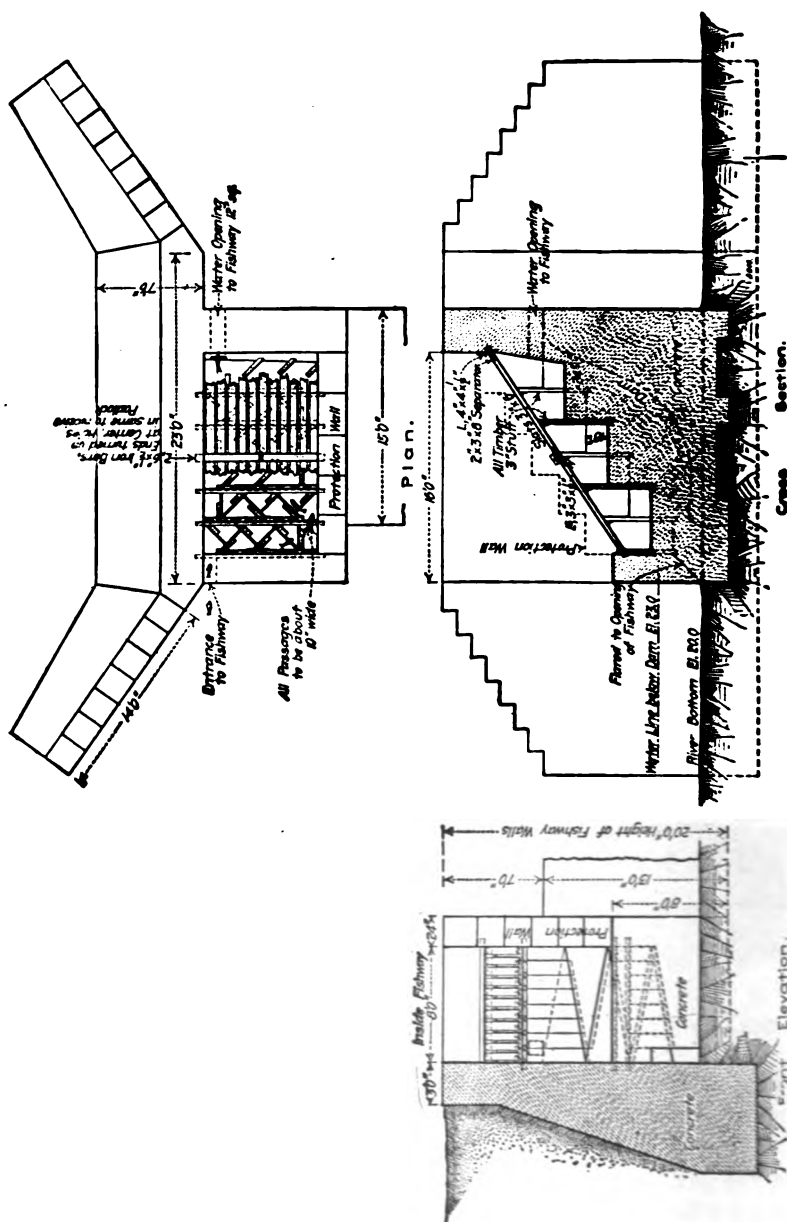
Concrete and Timber Fishway in Dam at Danville, Ill.
